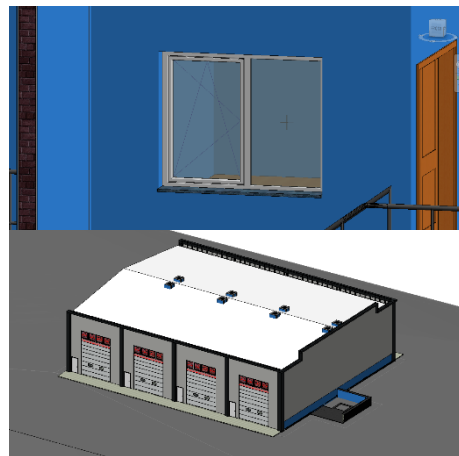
Fine Construction and Interior Wall (20 cm) & Layers Modeling.
